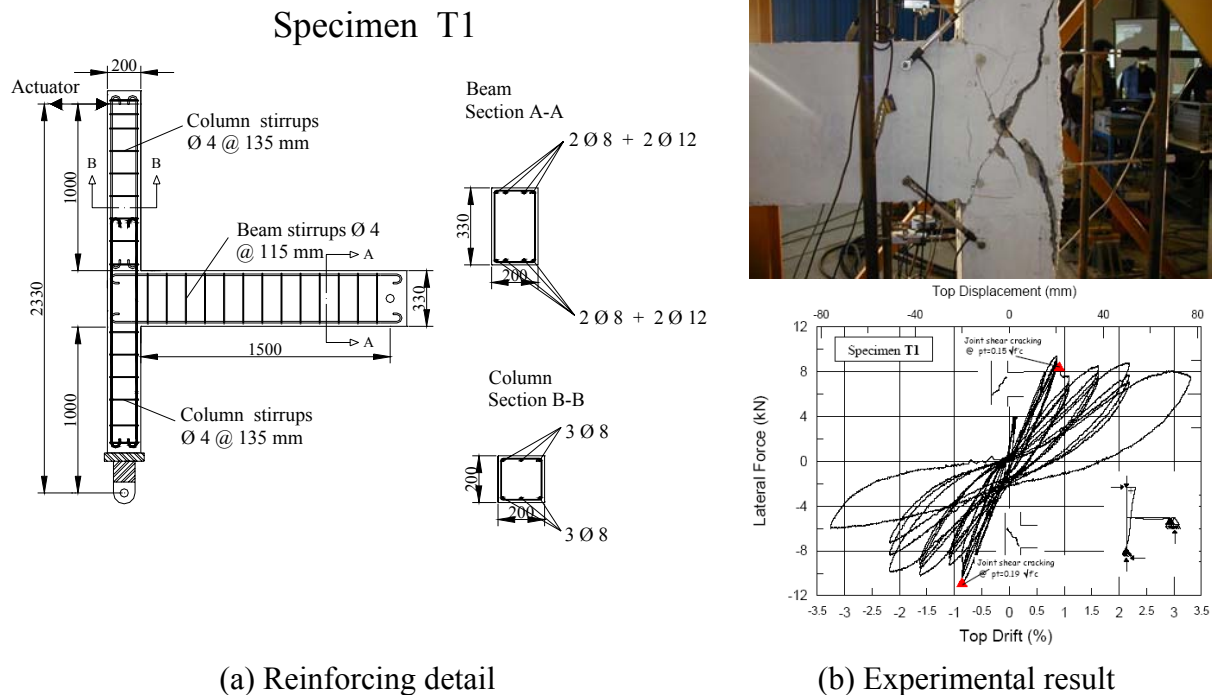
The exterior joint specimen using smooth bars [Pampanin, Calvi and Moratti, 2002]
